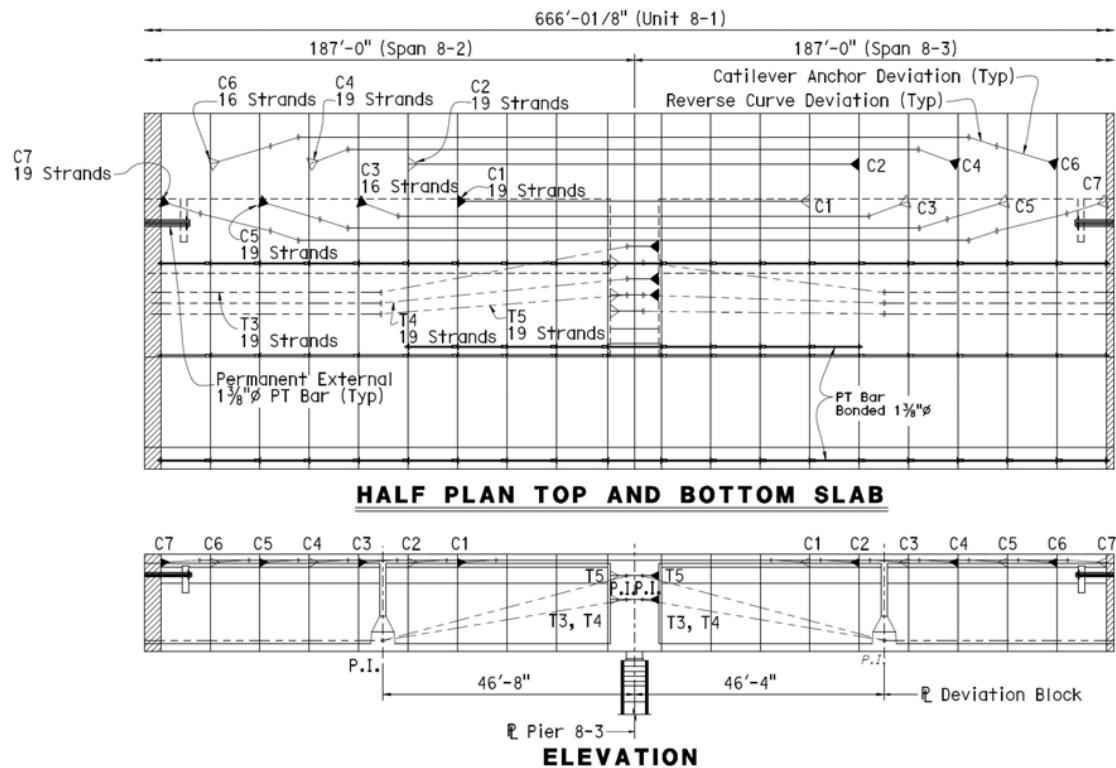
Tendon Layout for the Precast Segmental Cantilever Bridge Design Example
